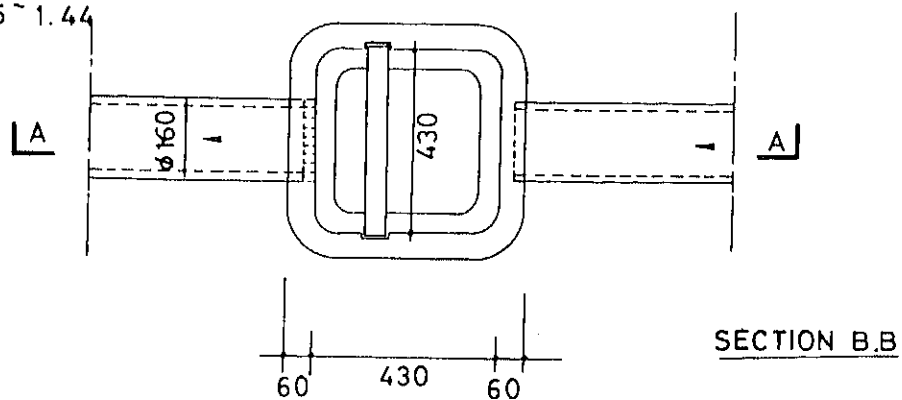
TYPICAL CONNECTION PIT (SHALLOWEST)
